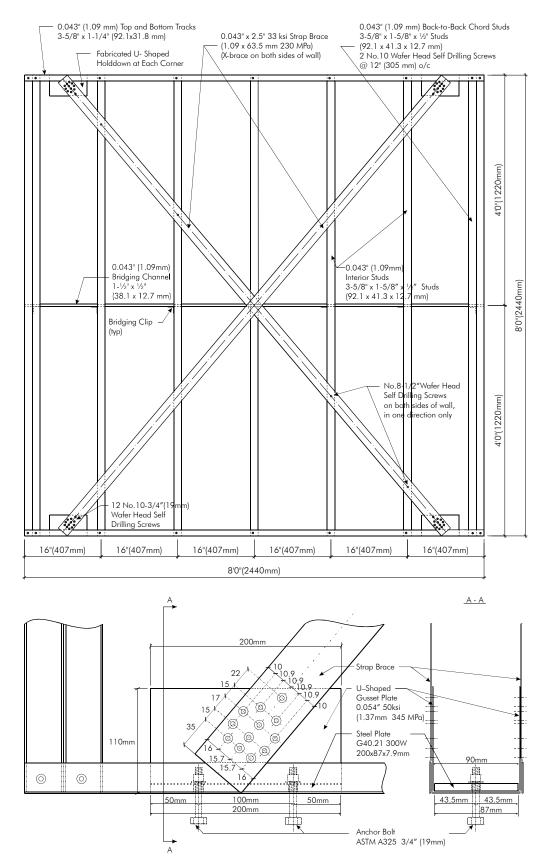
Nominal dimensions and the corner detail of specimens 41 A-M and 42 A-C
